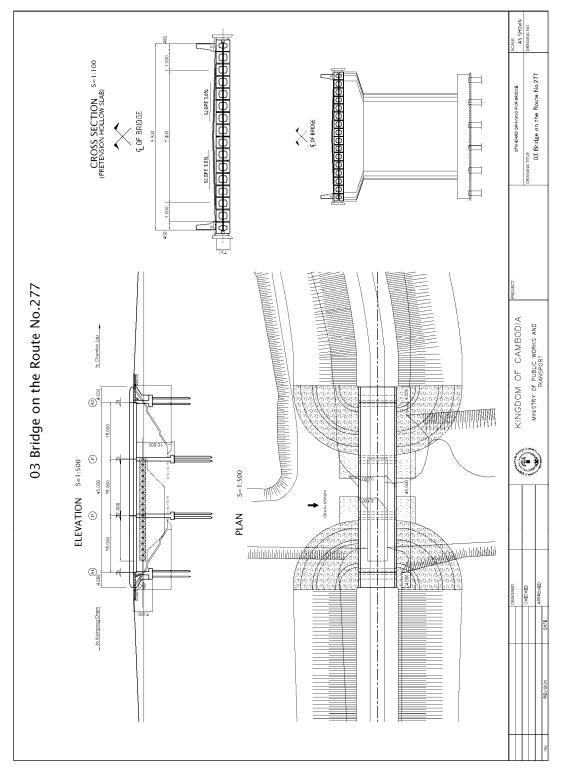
Plan of No3 Bridge on the Route No. 277
